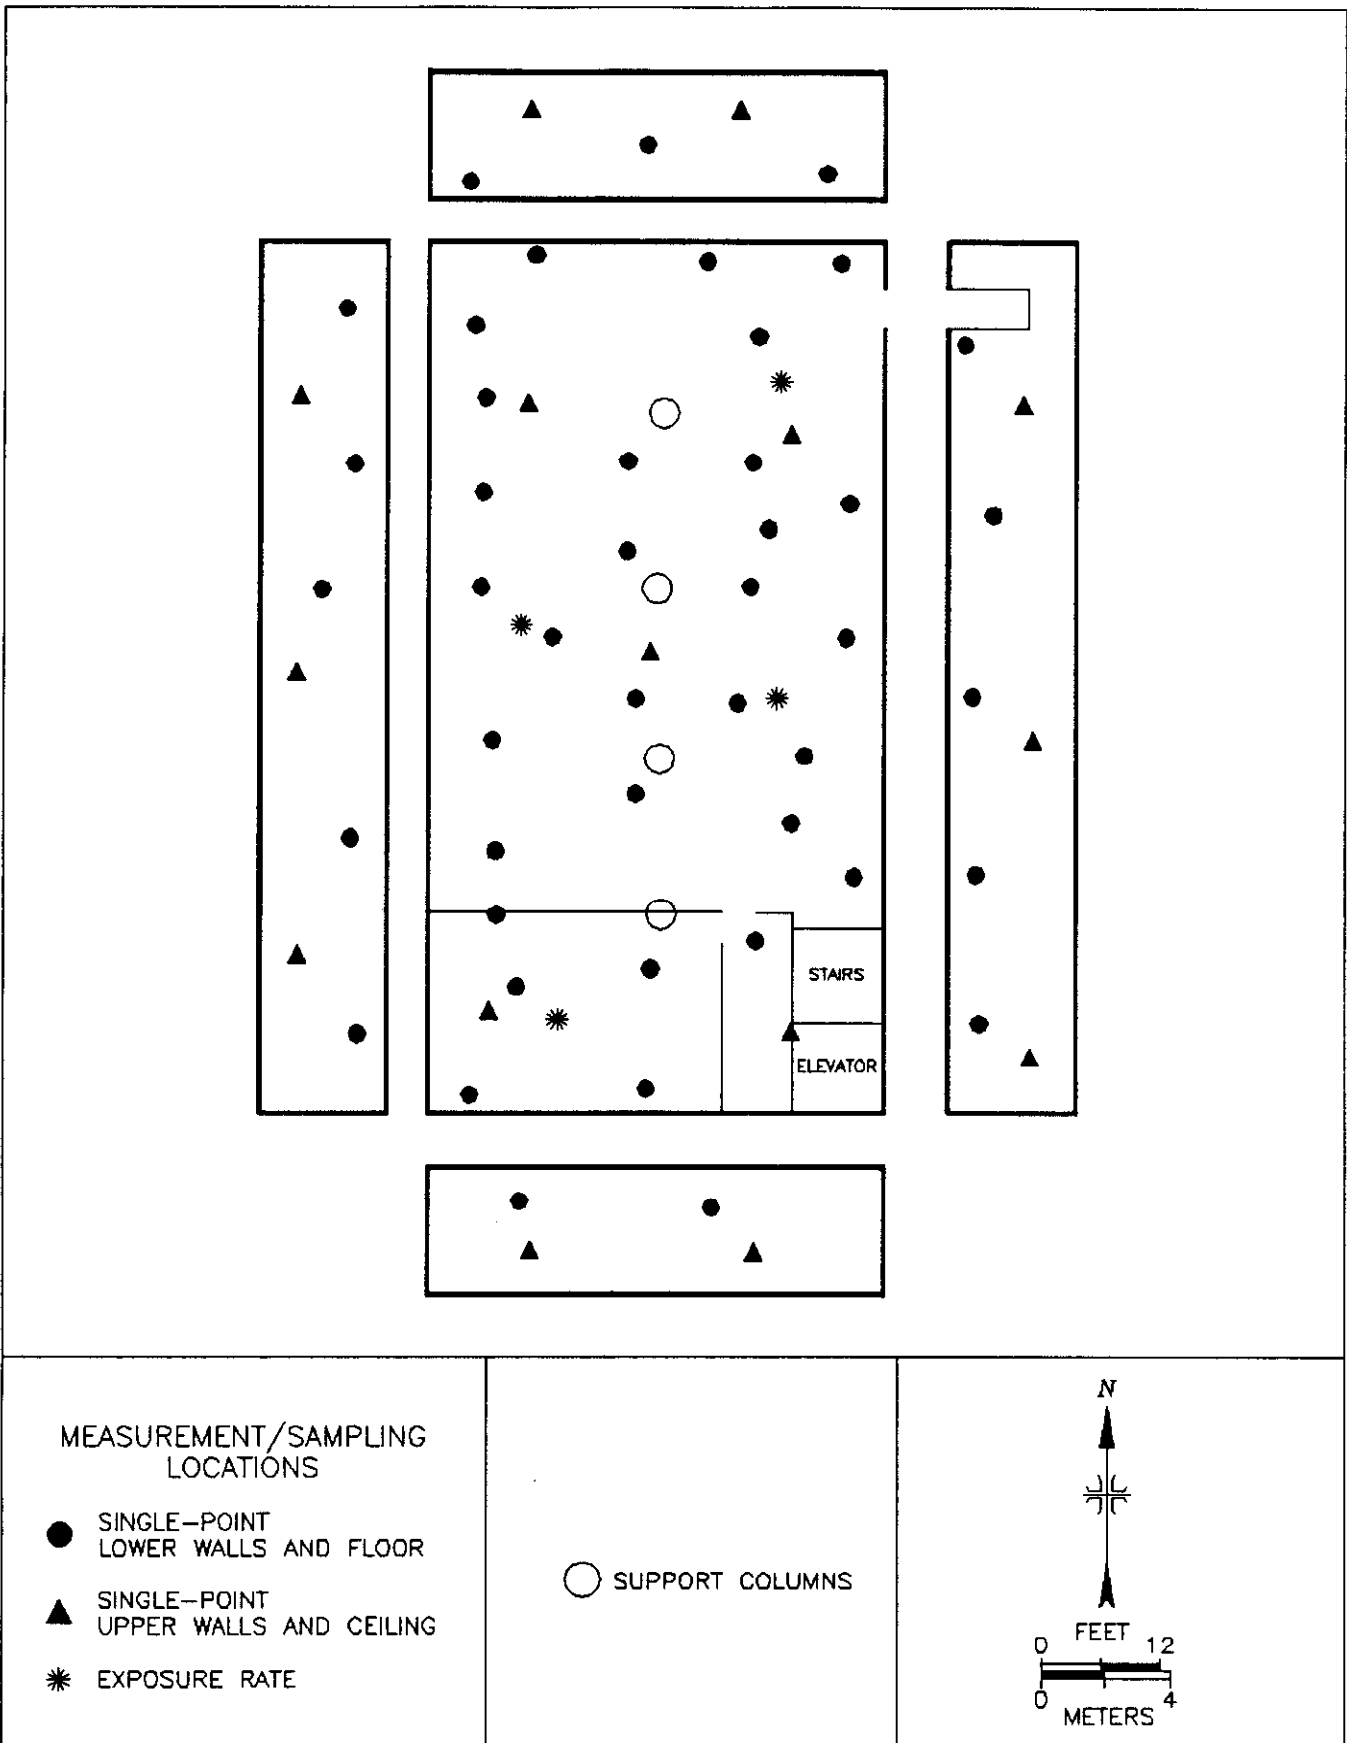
Second Floor, West Bay – Measurement and Sampling Locations
